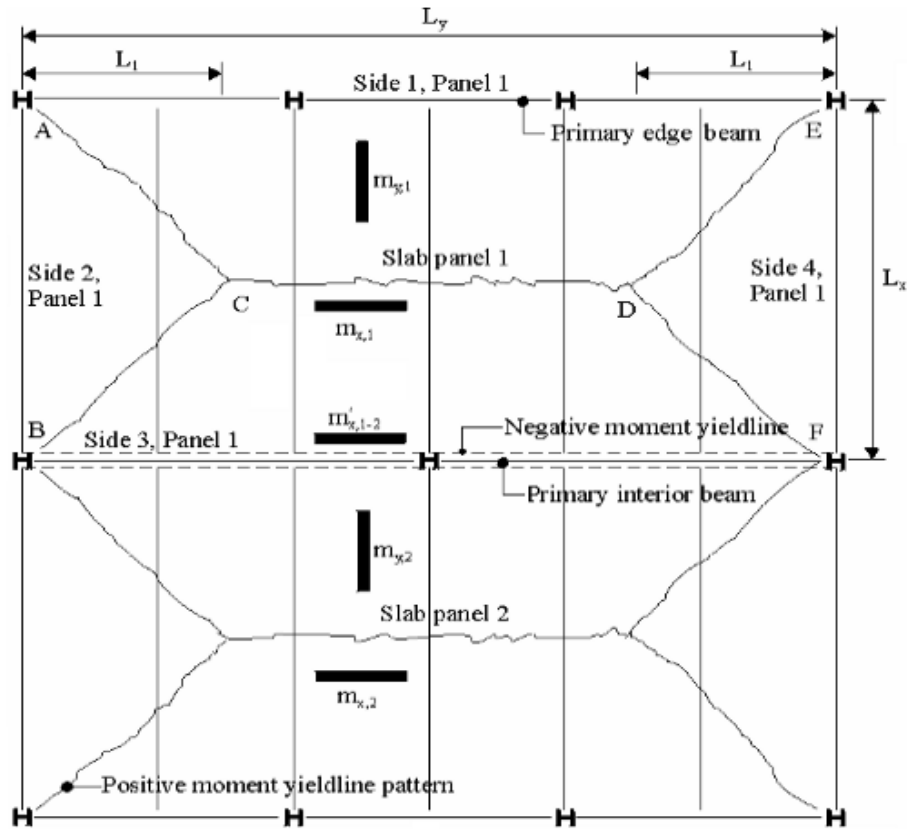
Floor plan showing external and internal edges (Clifton, 2006)
